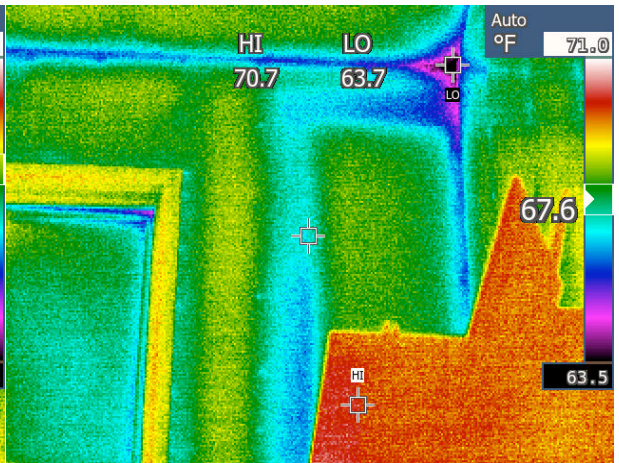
P1 thermal bridge at “strong wall” upstairs
